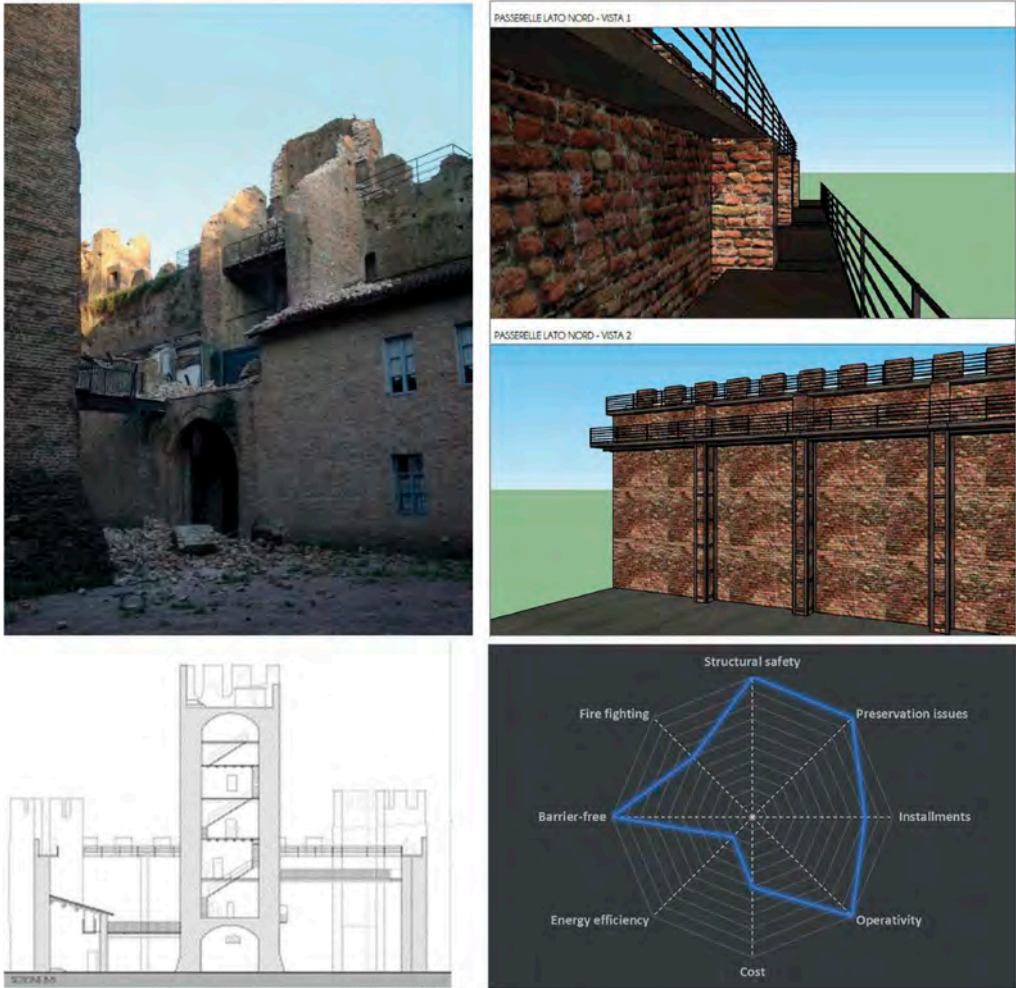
Rocca di Reggiolo (RE). In view of the general collapse of the battlements and walls surrounding the central donjon, the solution proposed was to intervene with “anti-seismic footbridges” made of steel, which act as bracing, provide access and remove architectural barriers. This intervention effectively meets the need for structural reinforcement, but also respects its listed status, because the historic building is not altered (the wall can be rebuilt, the battlement can be repositioned). For plant engineering purposes it can be used to carry ducts or support lighting equipment, operationally it is a particularly clever solution because it opens up new pathway to ensure that the historic building is more accessible, more open to visitors, and from the point of view of architectural barriers it is an excellent choice; it may not be the best solution for fire safety, as the material proposed is among the most vulnerable to heat sources, but on the other hand it can provide an escape route in case of fire. Compared to other objectives such as energy efficiency, it does not constitute a significant improvement, but in this situation, this does not appear to be a decisive drawback. Finally, it may not be the cheapest intervention, in financial terms, but it is an intervention that meets several different needs: it can be said that this intervention is on several Pareto fronts, and certainly a positive assessment can be made.
